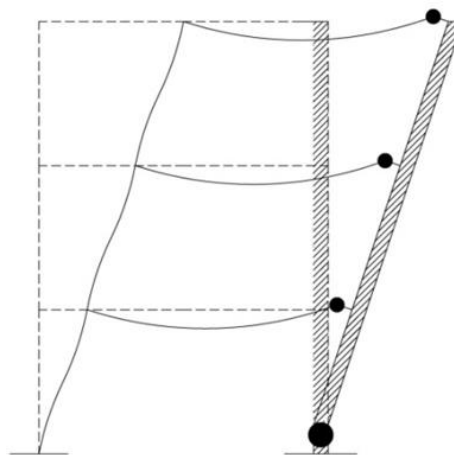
Typical inelastic deformation pattern of a frame-wall system
